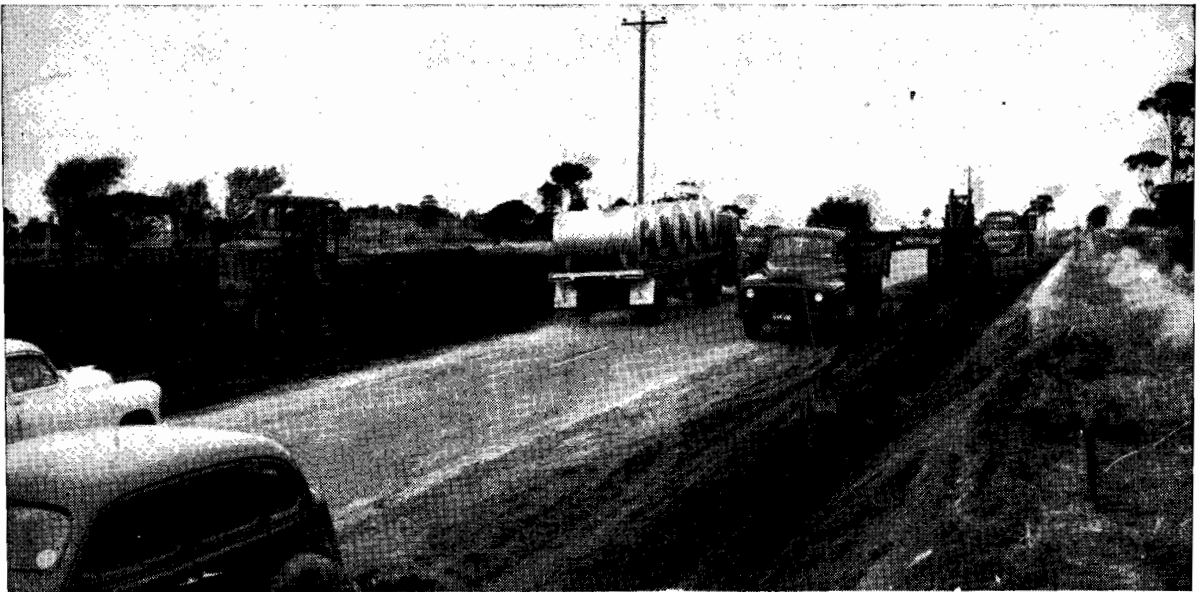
Heavy traffic on Western Highway, 58 miles, at Ryans cutting where work on widening is in progress.
